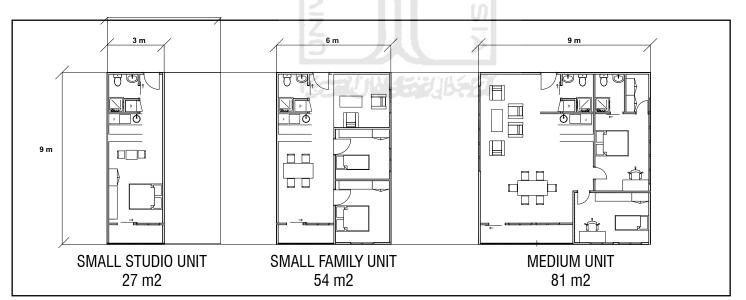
Apartment unit plan based on the module configuration Source: Author (2021)
